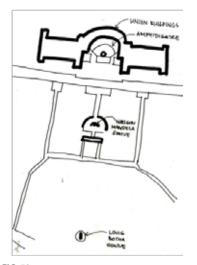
Sketch plan of Union buildings and gardens Drawing: authors own
